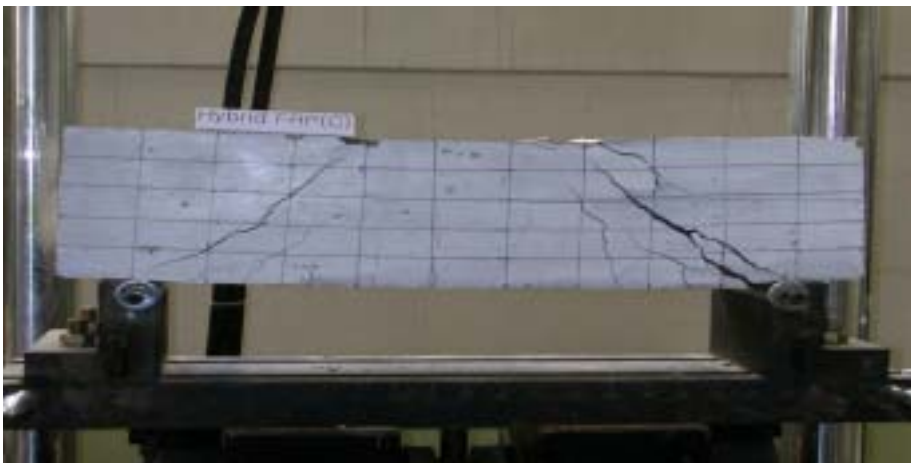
Photo of flexure and shear cracks from hybrid FRP rebar(C) reinforced concrete specimens
